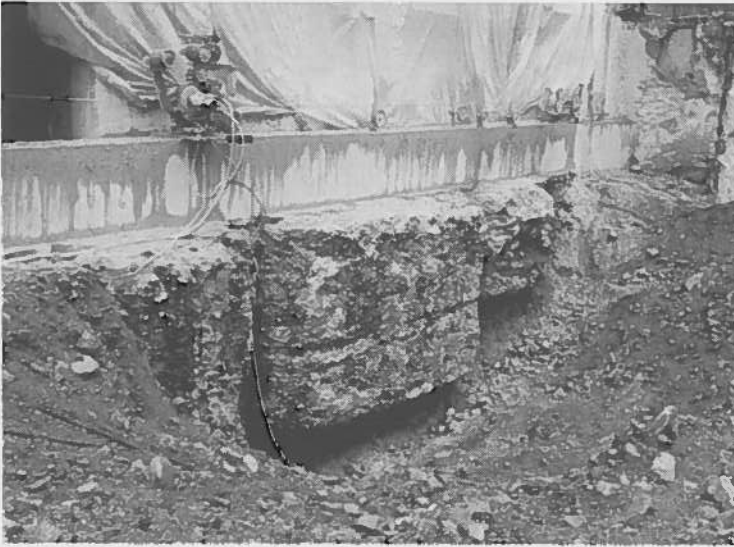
Block 76 Temple View Center footing in Dwall Alignment
